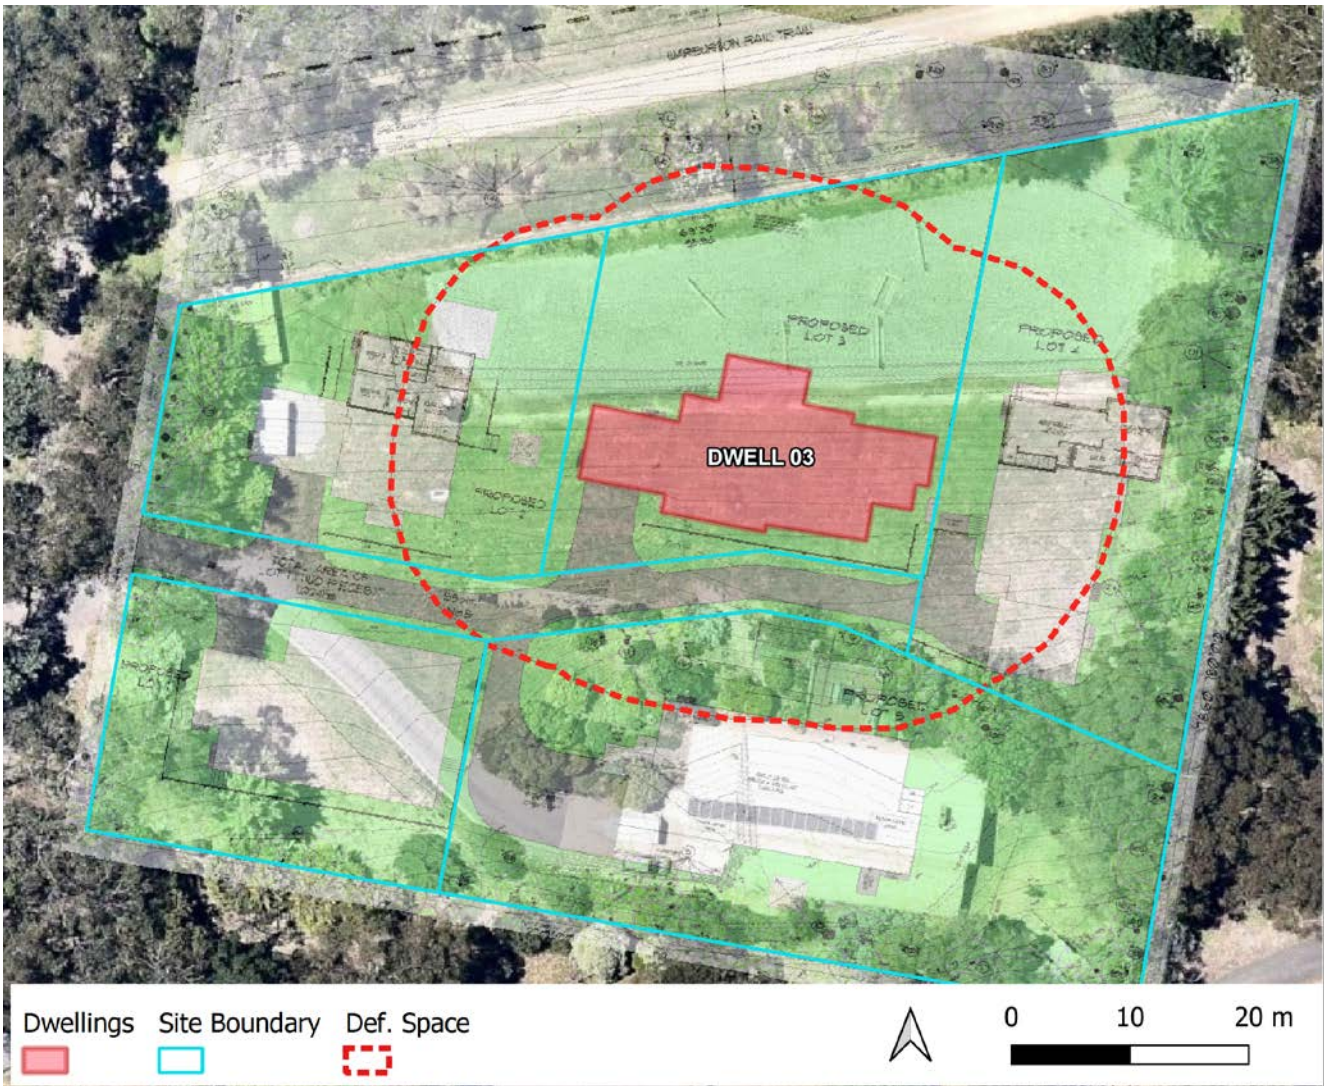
Lot 3 Defendable Space is within the subdivision’s boundary and on public road.
